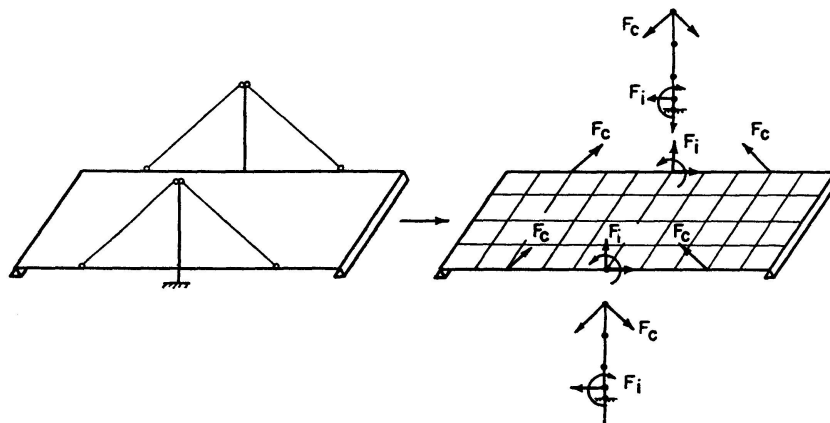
Typical bridge with finite element idealization and redundant forces.
